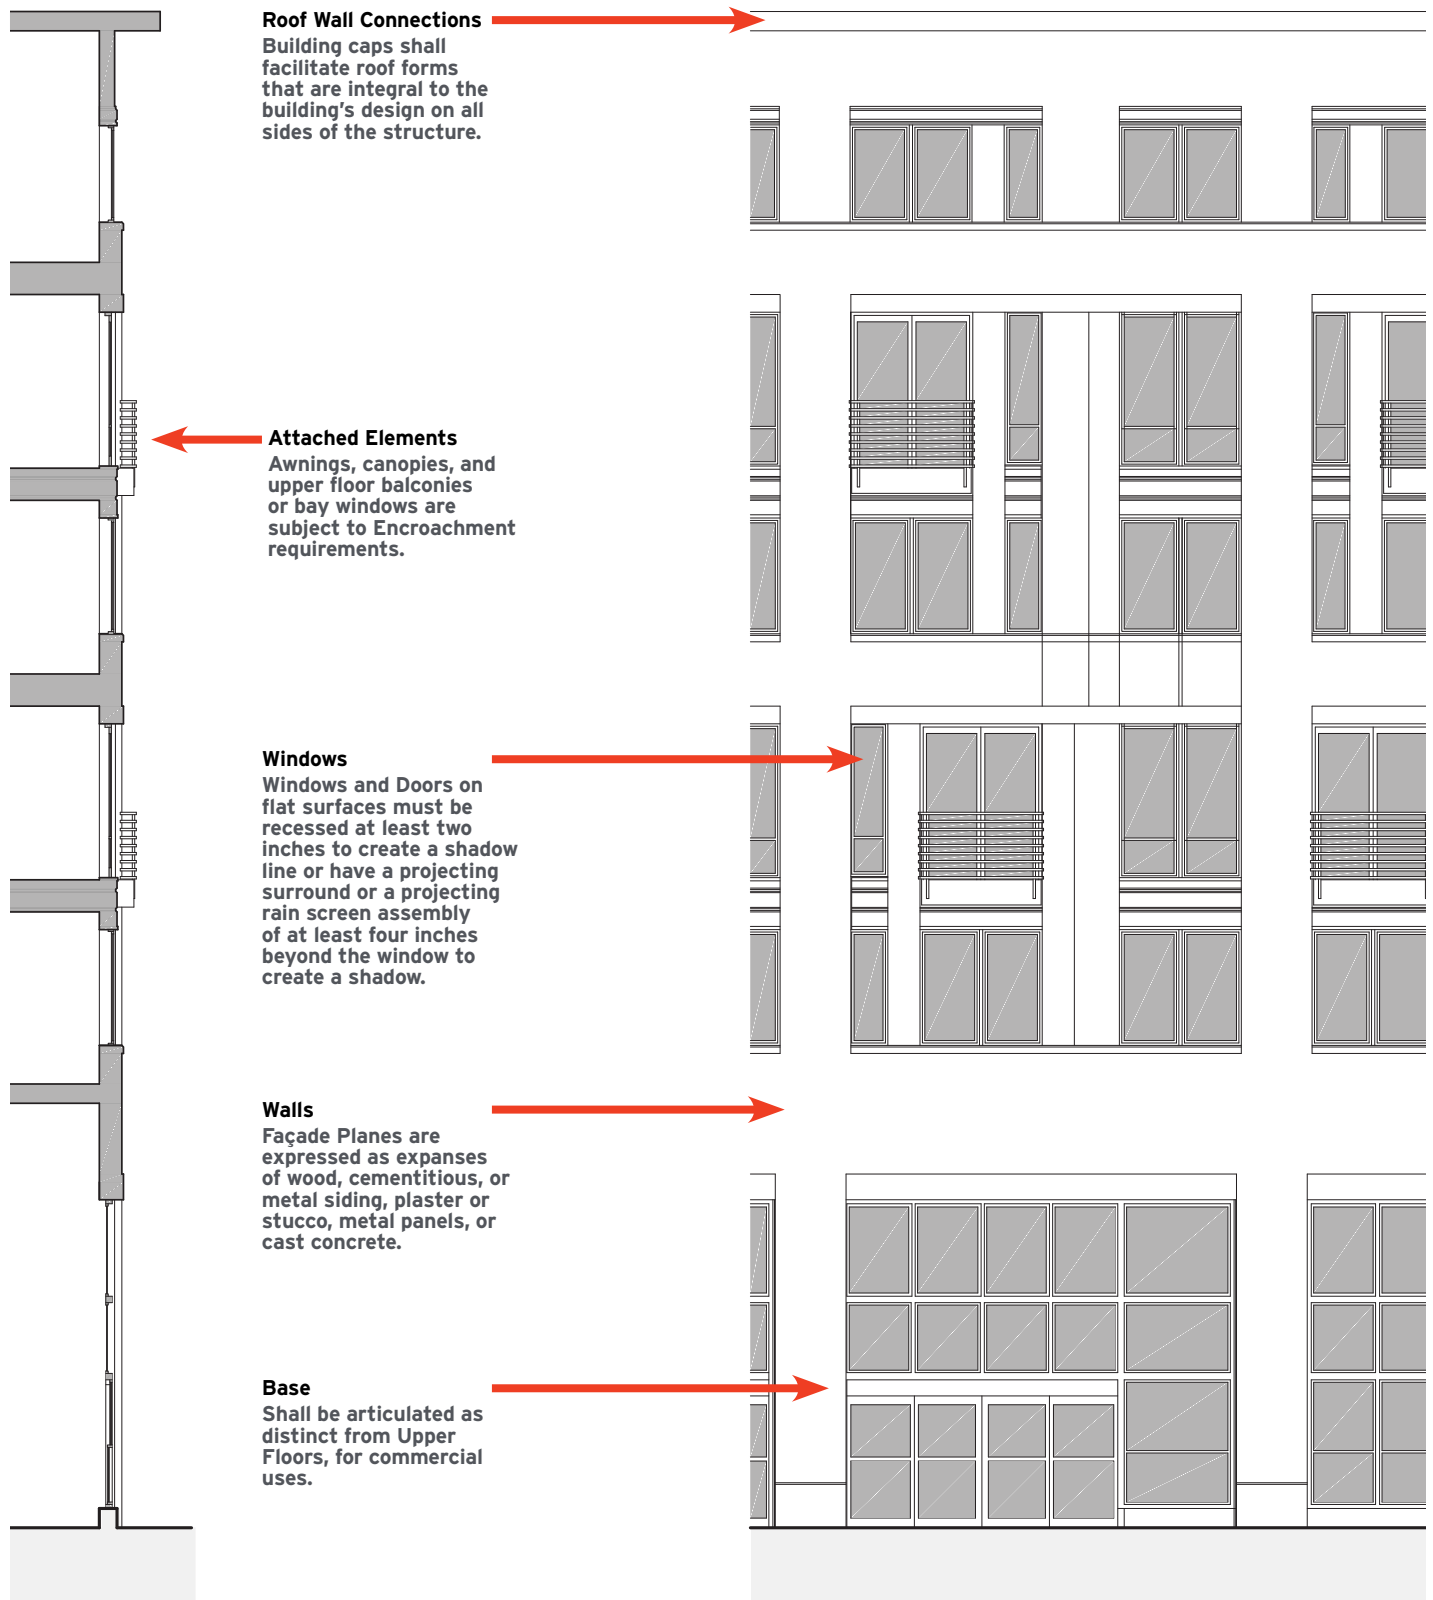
California Contemporary Elements Diagram (Ground Floor Commercial)
